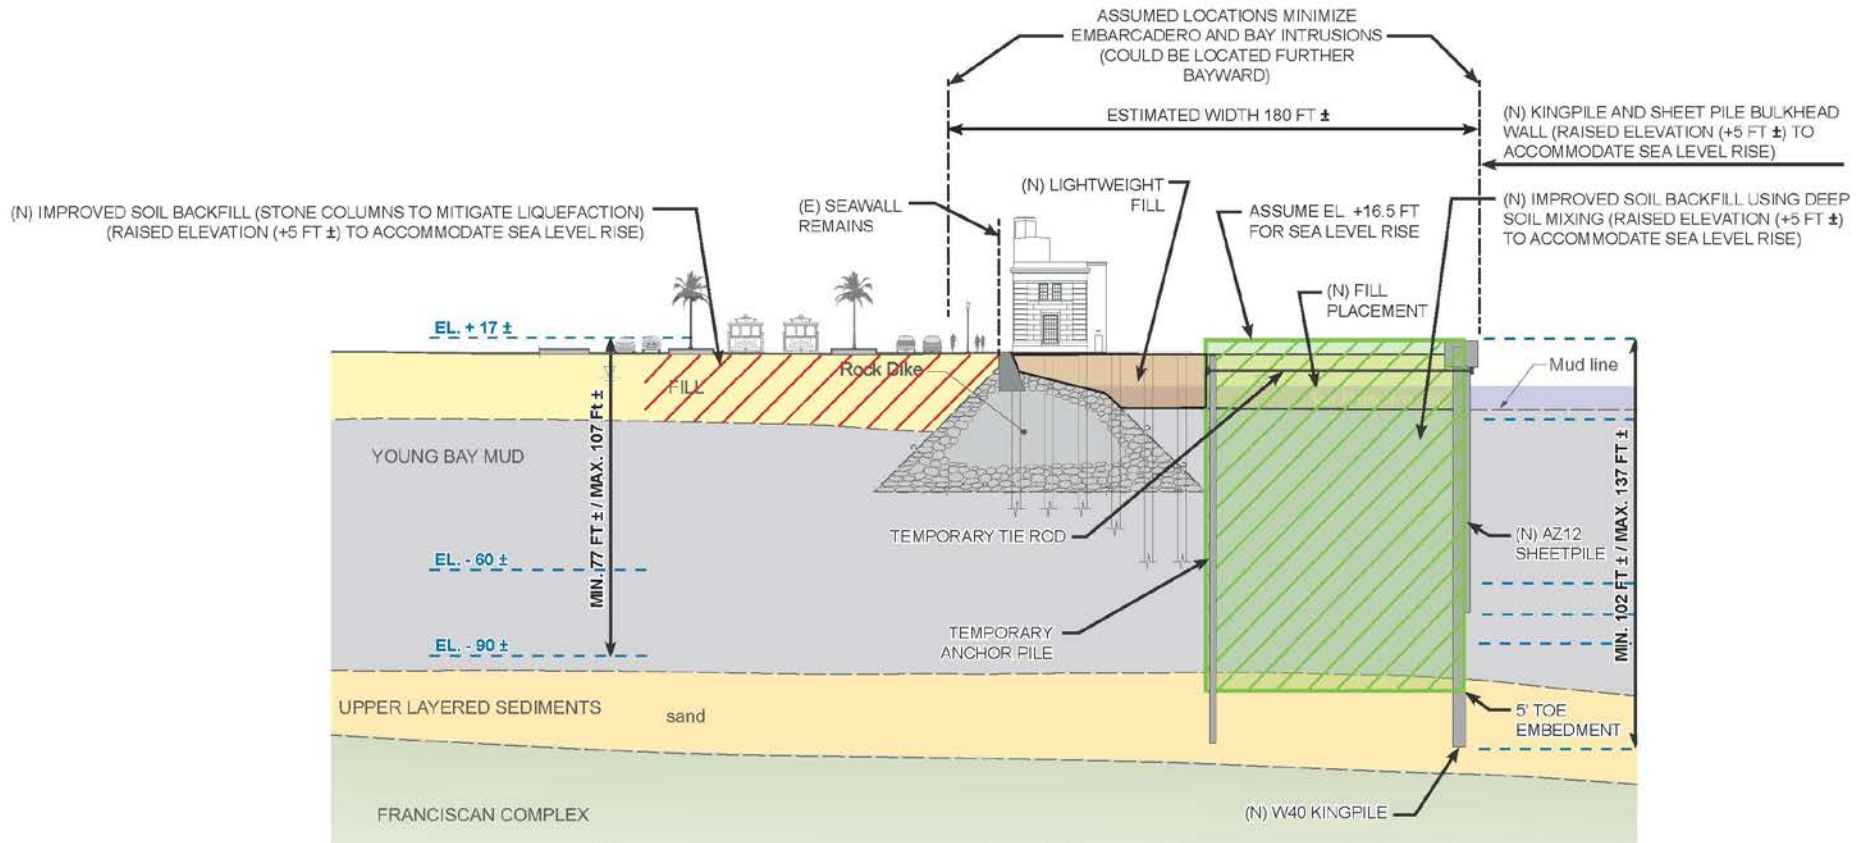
Long-Term Strategy Option - Bayward Seawall & Raising Embarcadero
